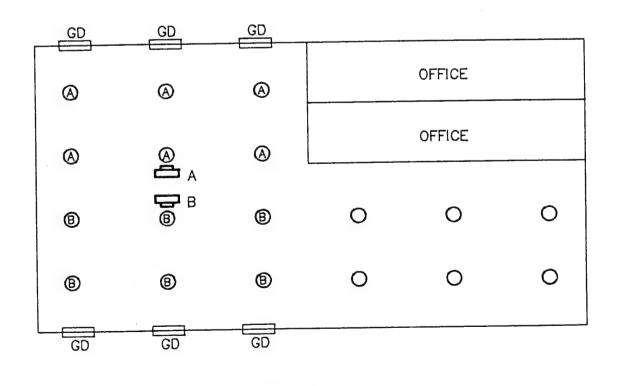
PHOTOCELL CONTROL LAYOUT - BUILDING 2944
